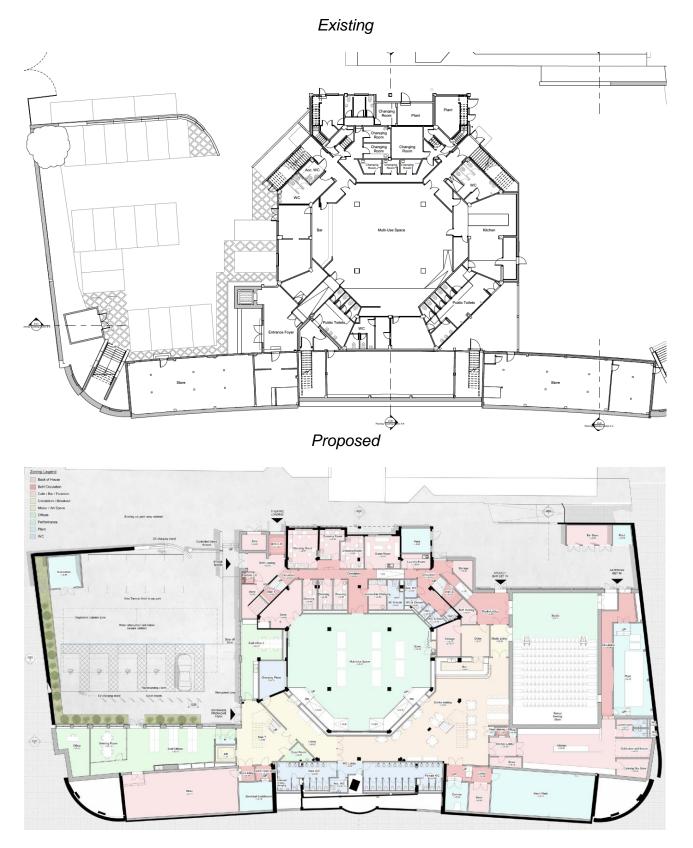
Existing & Proposed Lower Ground Floor Layout
